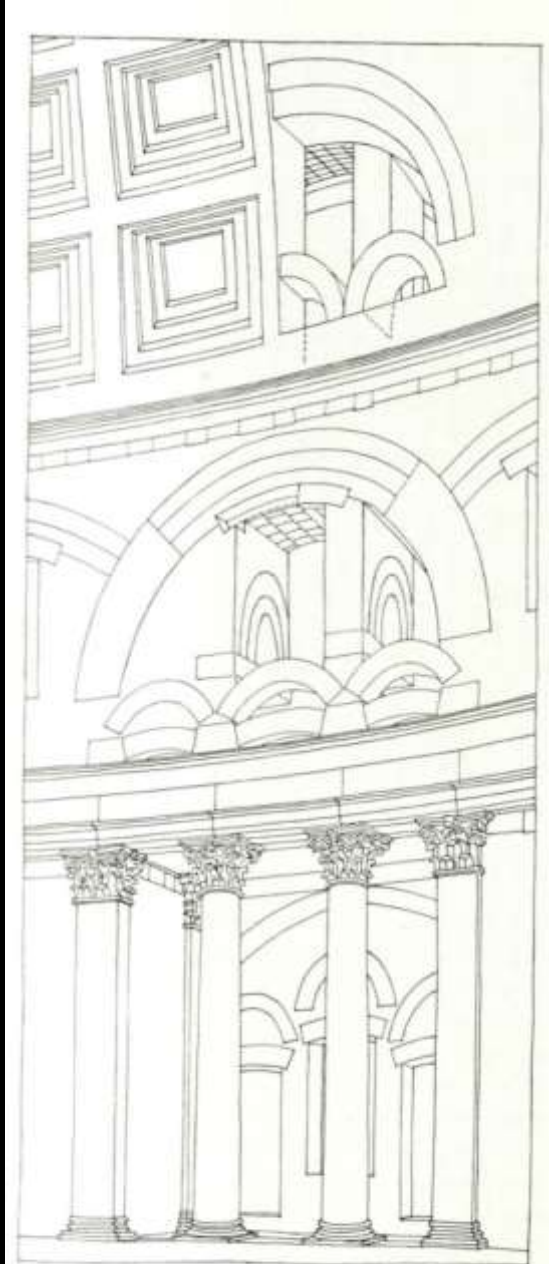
Pantheon: Drawing of the structural principle in a division of the wall of the rotunda.
